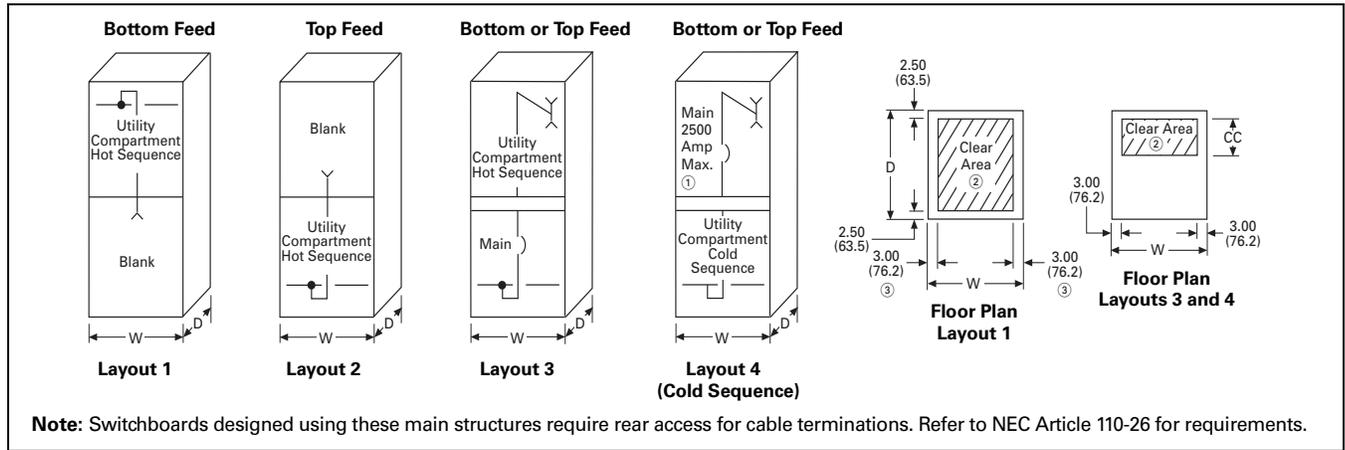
Utility Compartment Layouts—Dimensions in Inches (mm)
